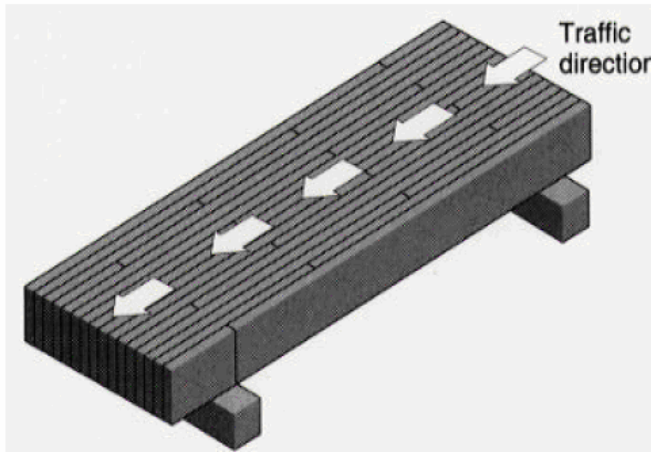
Example of a longitudinal nail-laminated deck, [16]
